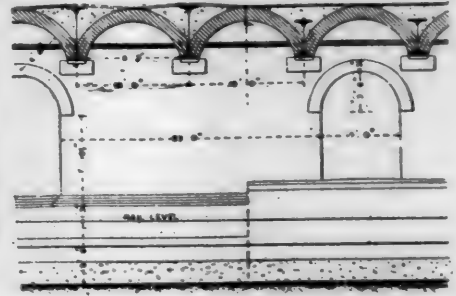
LONGITUDINAL SECTION OF COVERED WAY FOR CENTRAL STATION.
